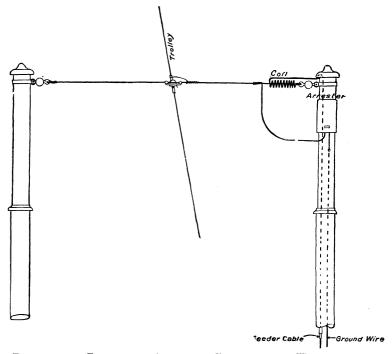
Diagram of Lightning Arrester Connections—Underground Feeders.
